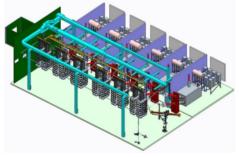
3D Model of Valve Hall and Converter Transformer Interface
